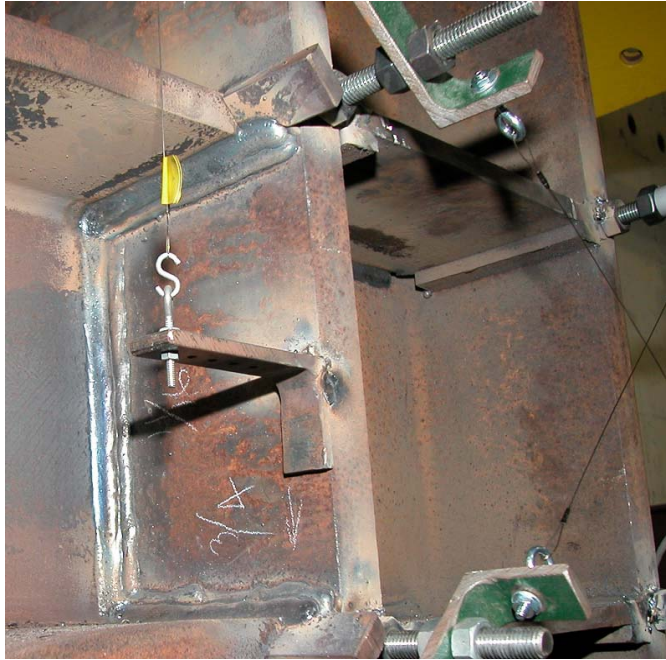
Fillet welds of the link web and the inside face of the flanges – Specimen AISC-4
